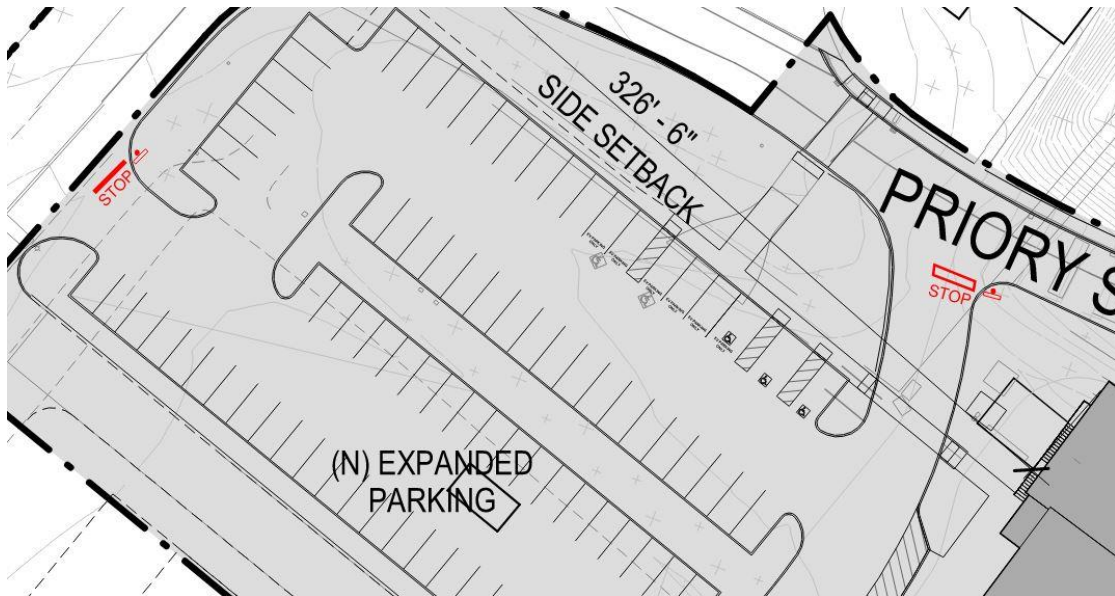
Recommended Stop Bar and Stop Sign Locations
